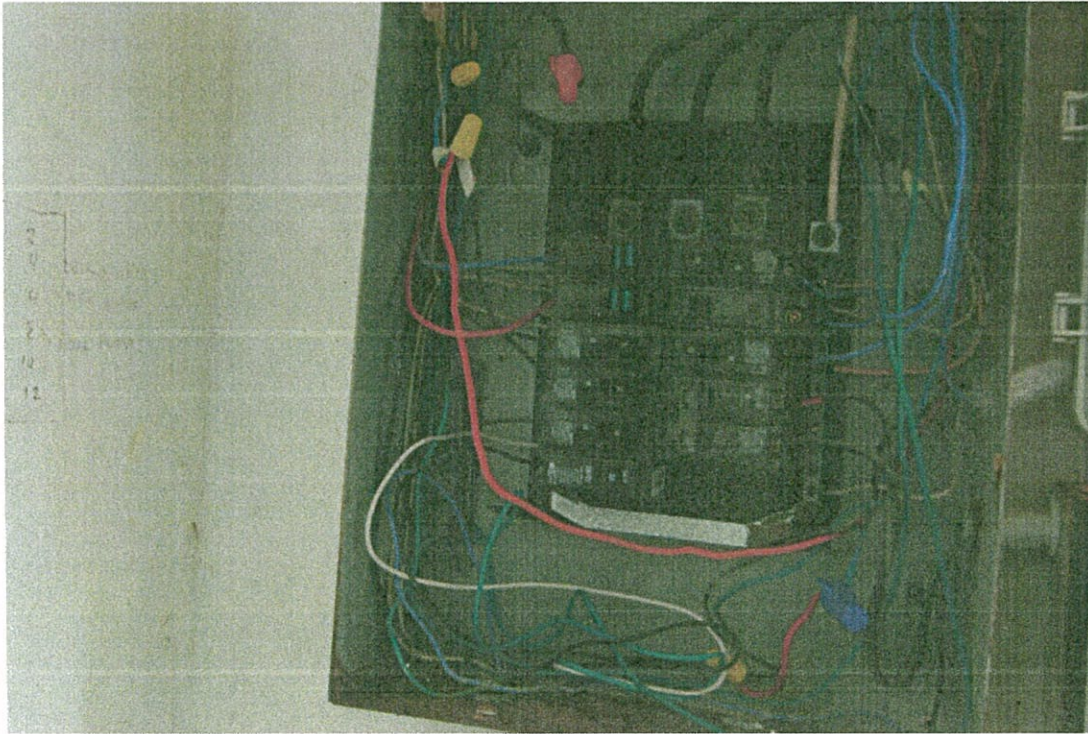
VIEW OF ELECTRICAL PANELBOARD IN POOL EQUIPMENT BUILDING
